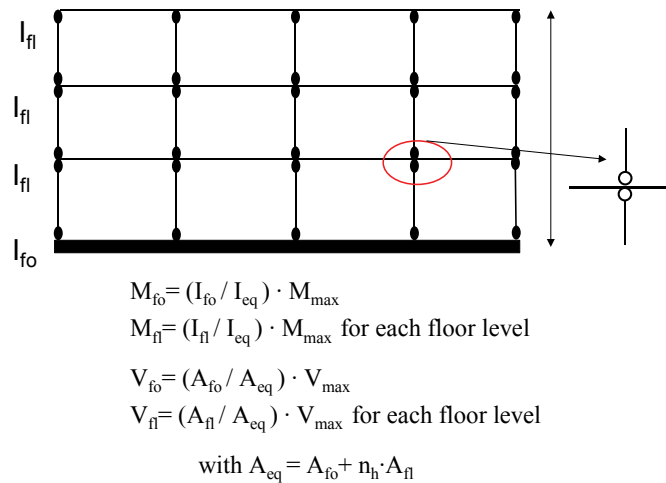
Moments and shear forces in a frame structure with continuous beams and hinged connections between columns/walls and the floor beams.
